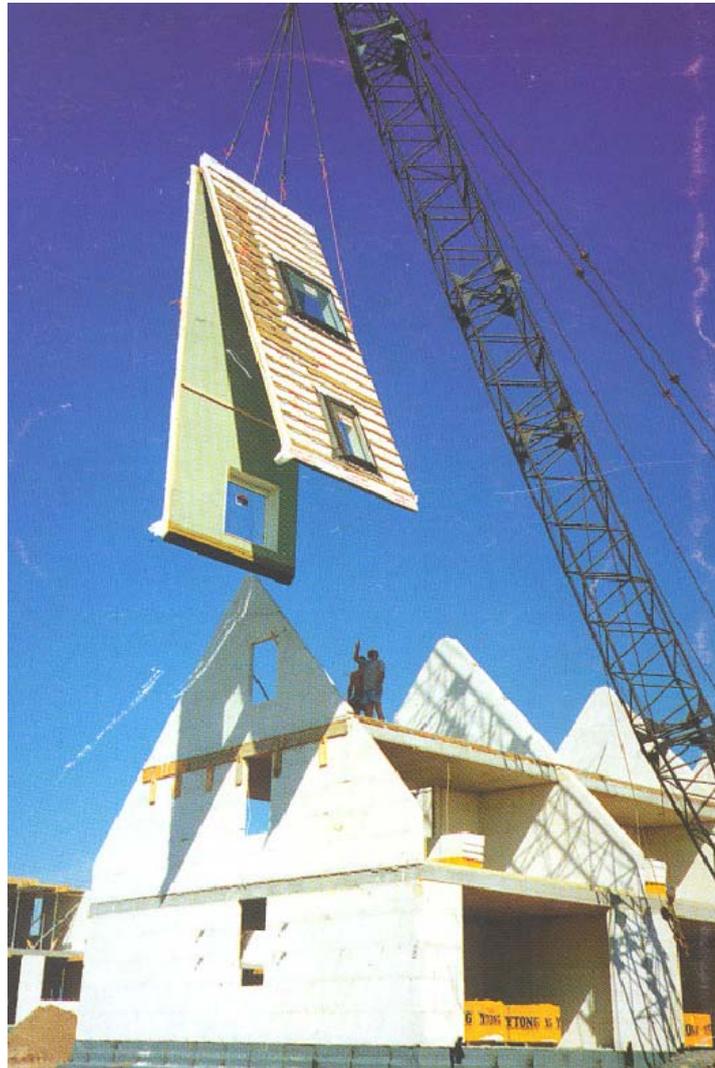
Opstalan roof system. Note, location of second storey level and the lack of tension strut at the bottom of the panel
